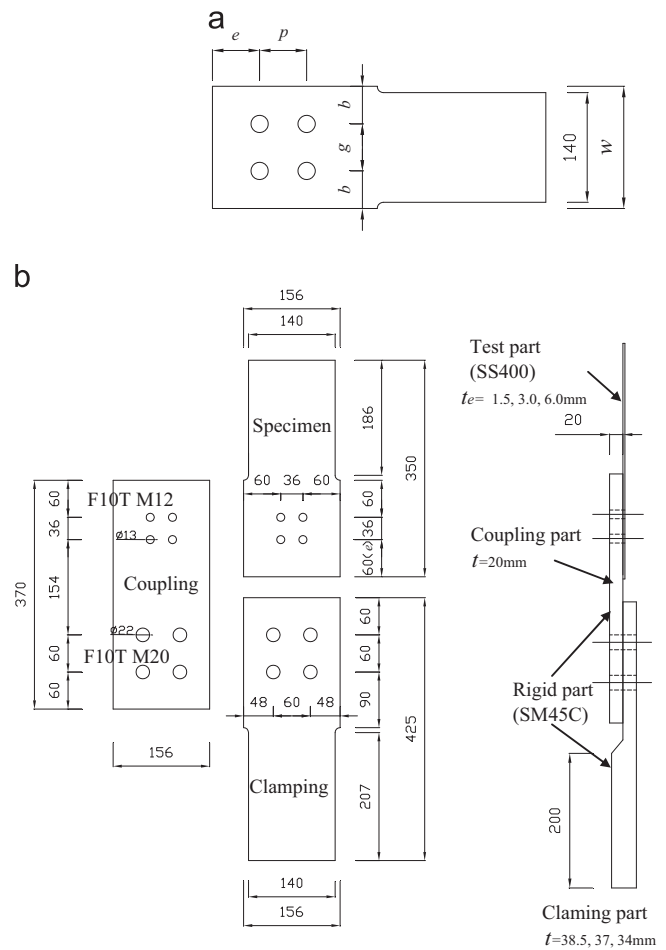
Geometry and assembly of specimens. (a) Geometry of specimen and (b) Assembly of test part and rigid parts.
